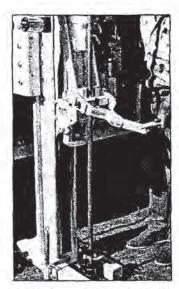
Raise the inner rod string using the probe hammer and a Rod Grip Pull Sytem if rods are too heavy to lift by hand.
